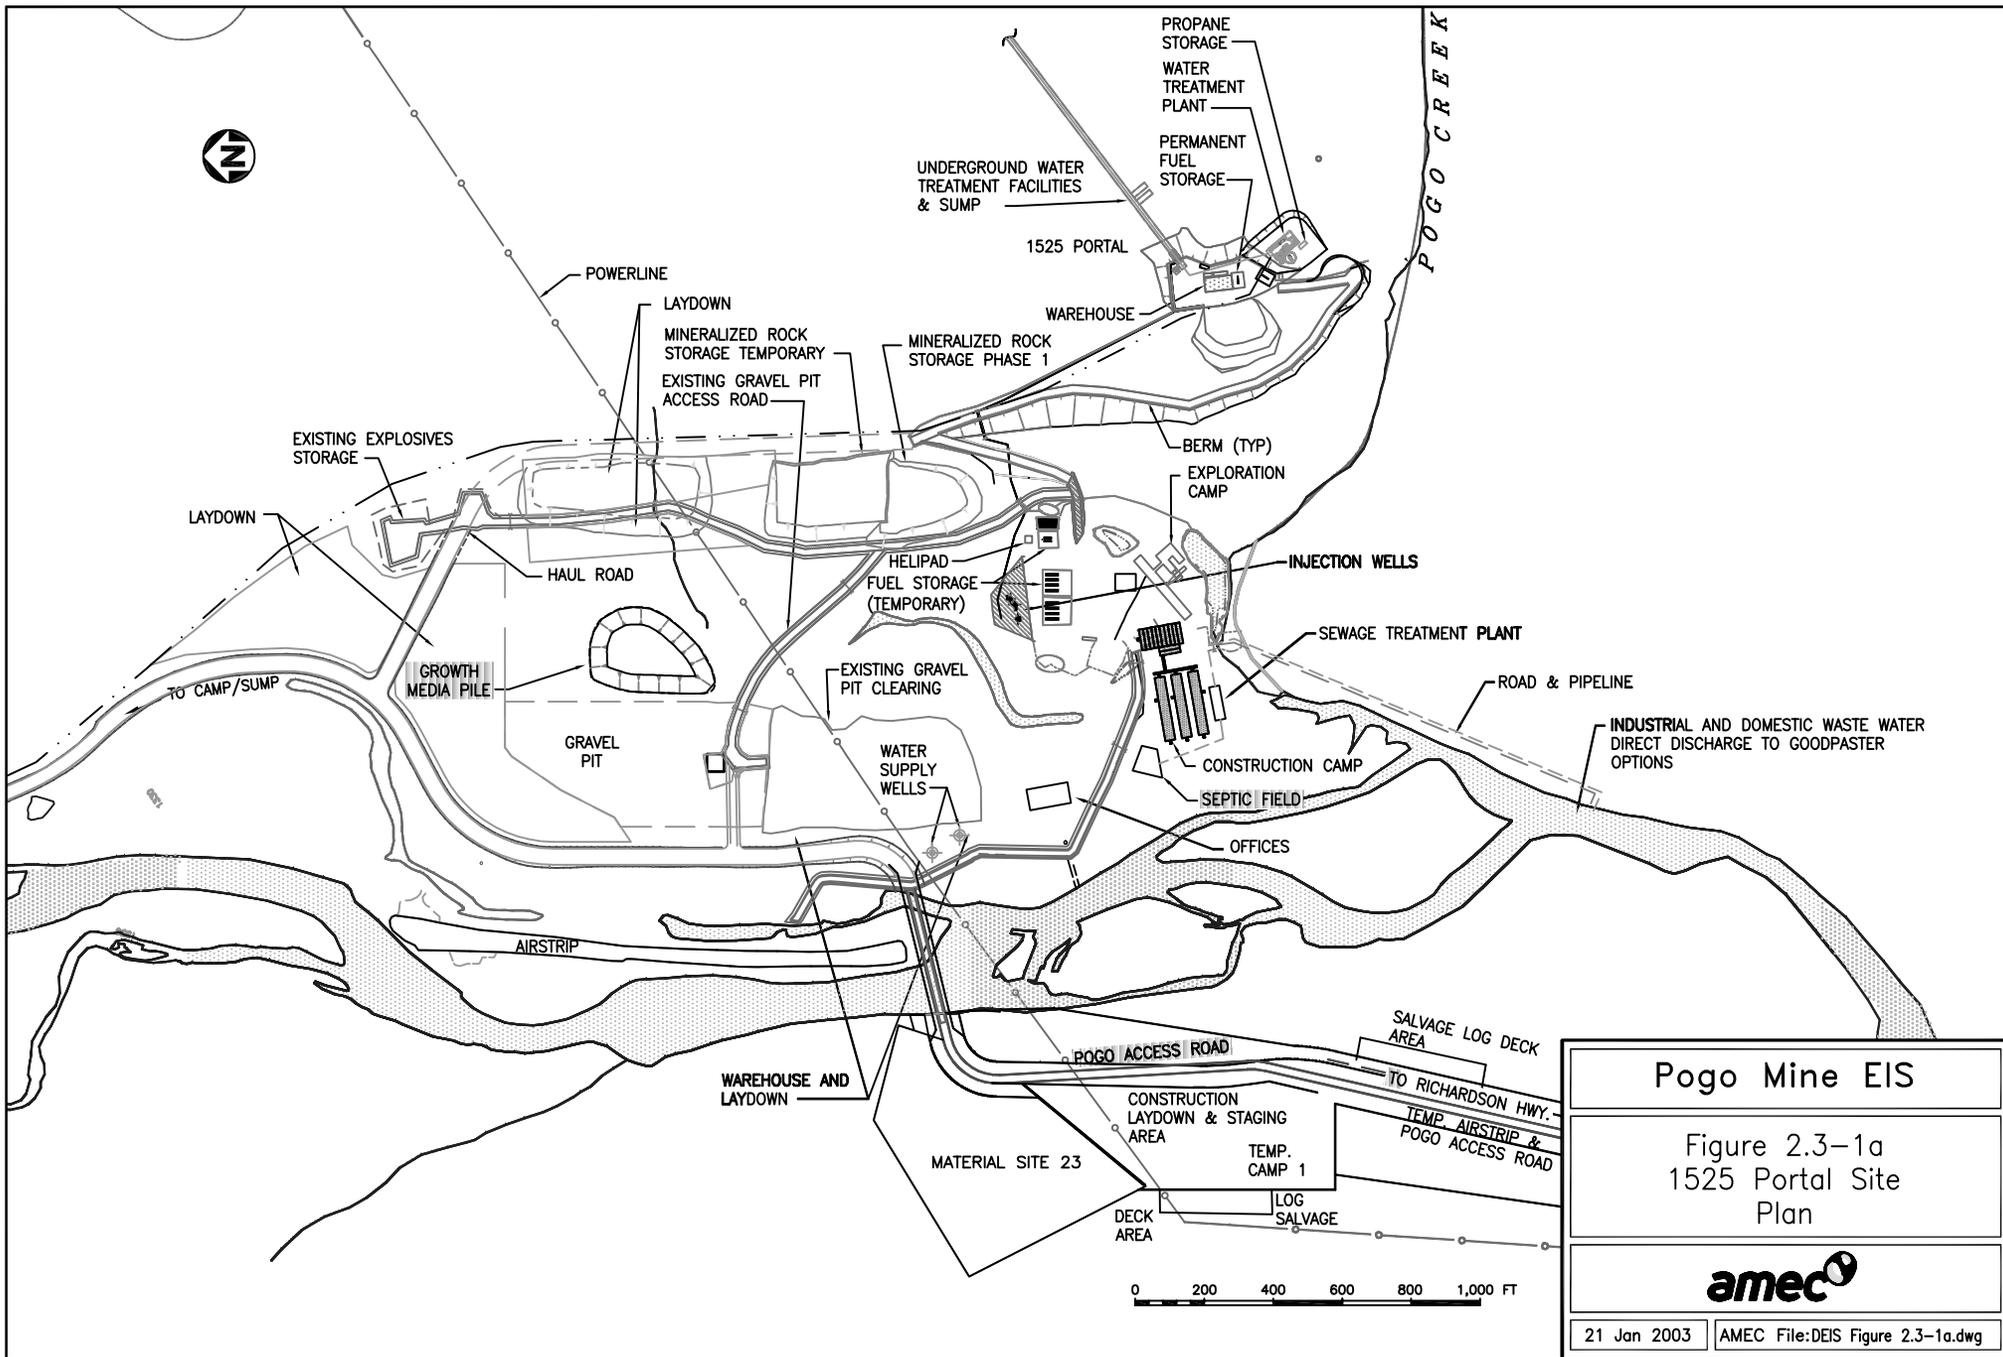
presents the general mine site plan for the Applicant’s proposed all-season road option. Subsequent figures present the existing mine portal site plan (2.3-1 a), airstrip and associated facilities (2.3-1 b), Liese Creek Valley mill site plan (2.3-1 c), Liese Creek Valley camp and shop plan (2.3-1 d), and the Liese Creek Valley recycle tailings pond (RTP) and tailing treatment facility plan (2.3-1 e).
